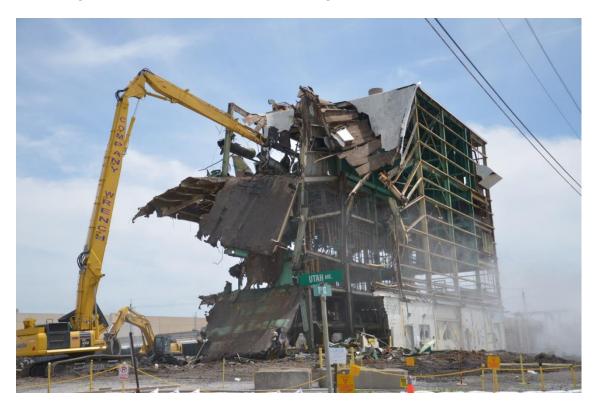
High Reach Excavator Demolishing Northern End of C-420 Building (view toward southeast)
